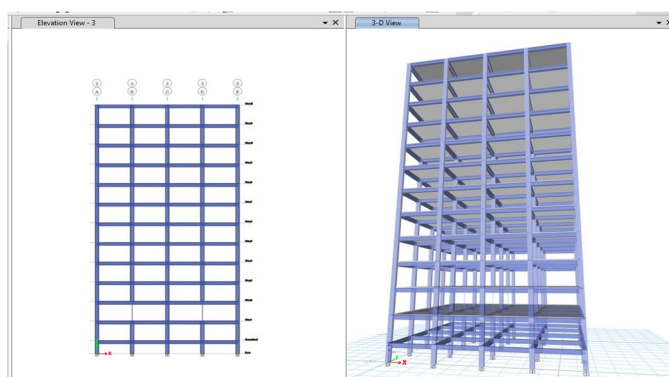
Model C- Building frame with Floating Column @ 1st Floor at interior position
